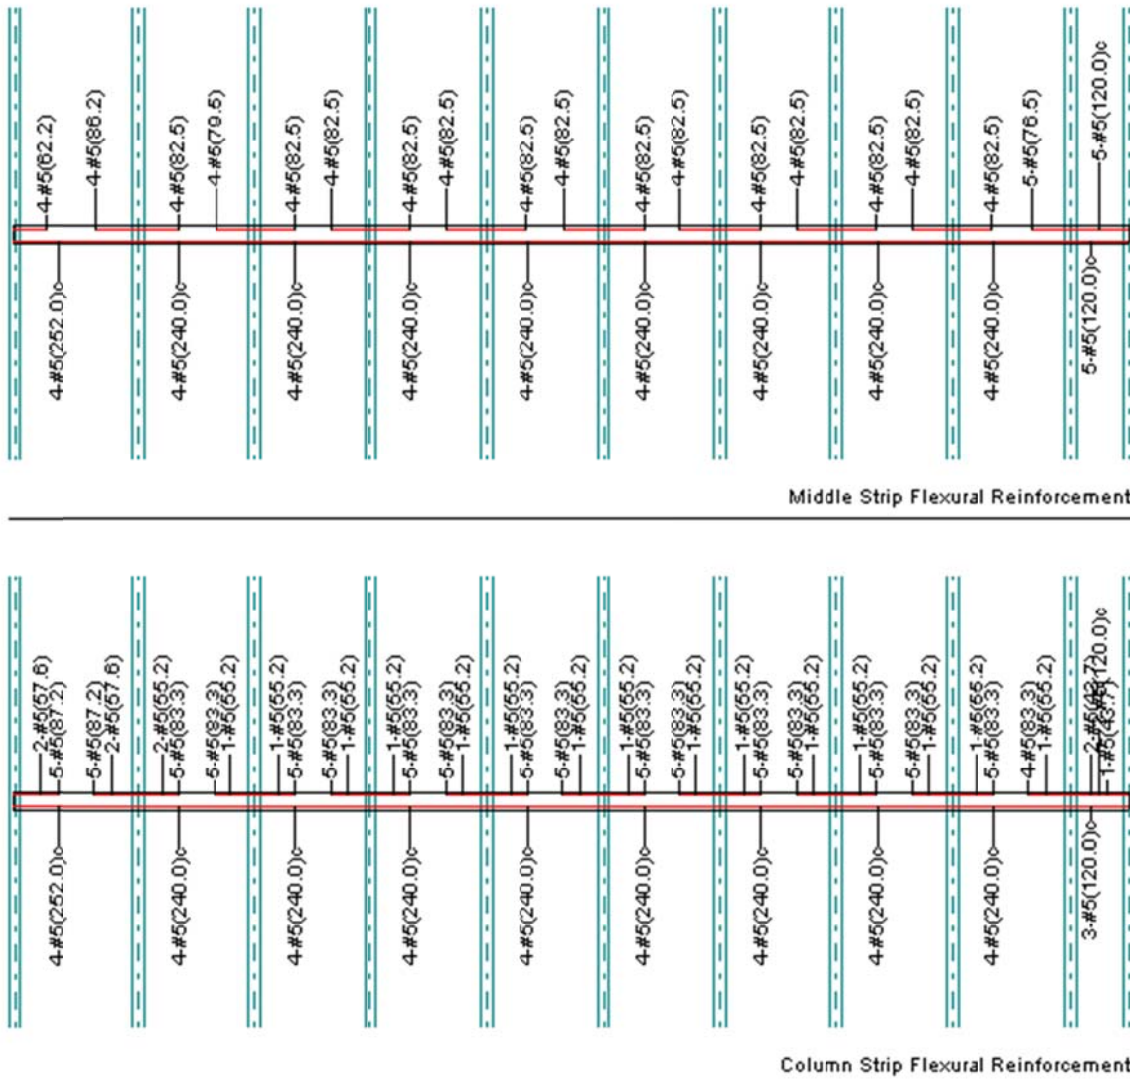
spSlab Column Line 1 Reinforcing Diagram
